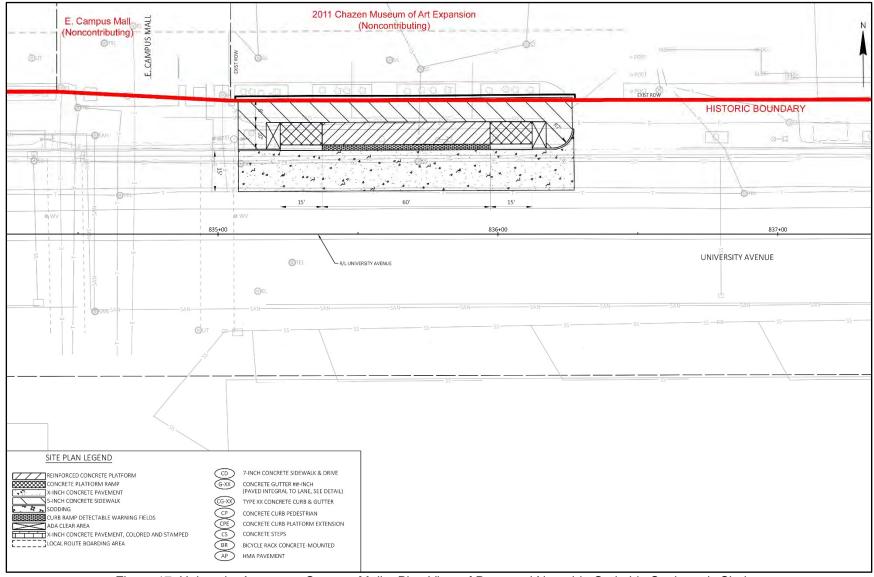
University Avenue at Campus Mall – Plan View of Proposed Nearside Curbside Station w/o Shelter
